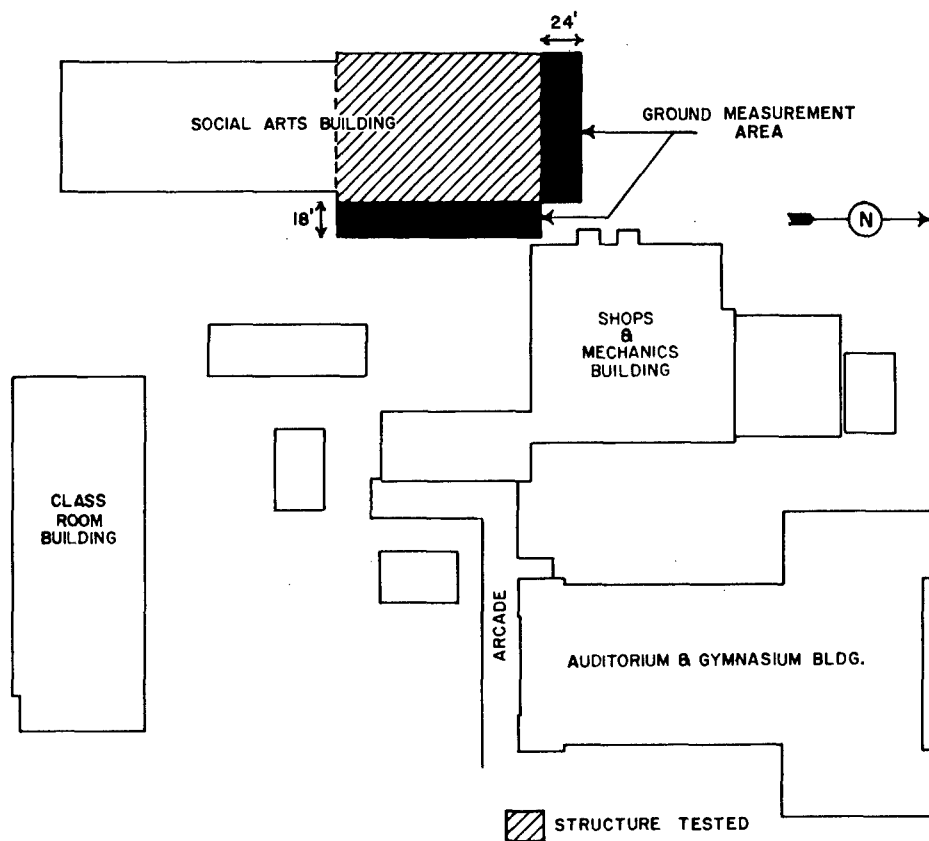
Tubing locations at North Hollywood High School classroom structure.
